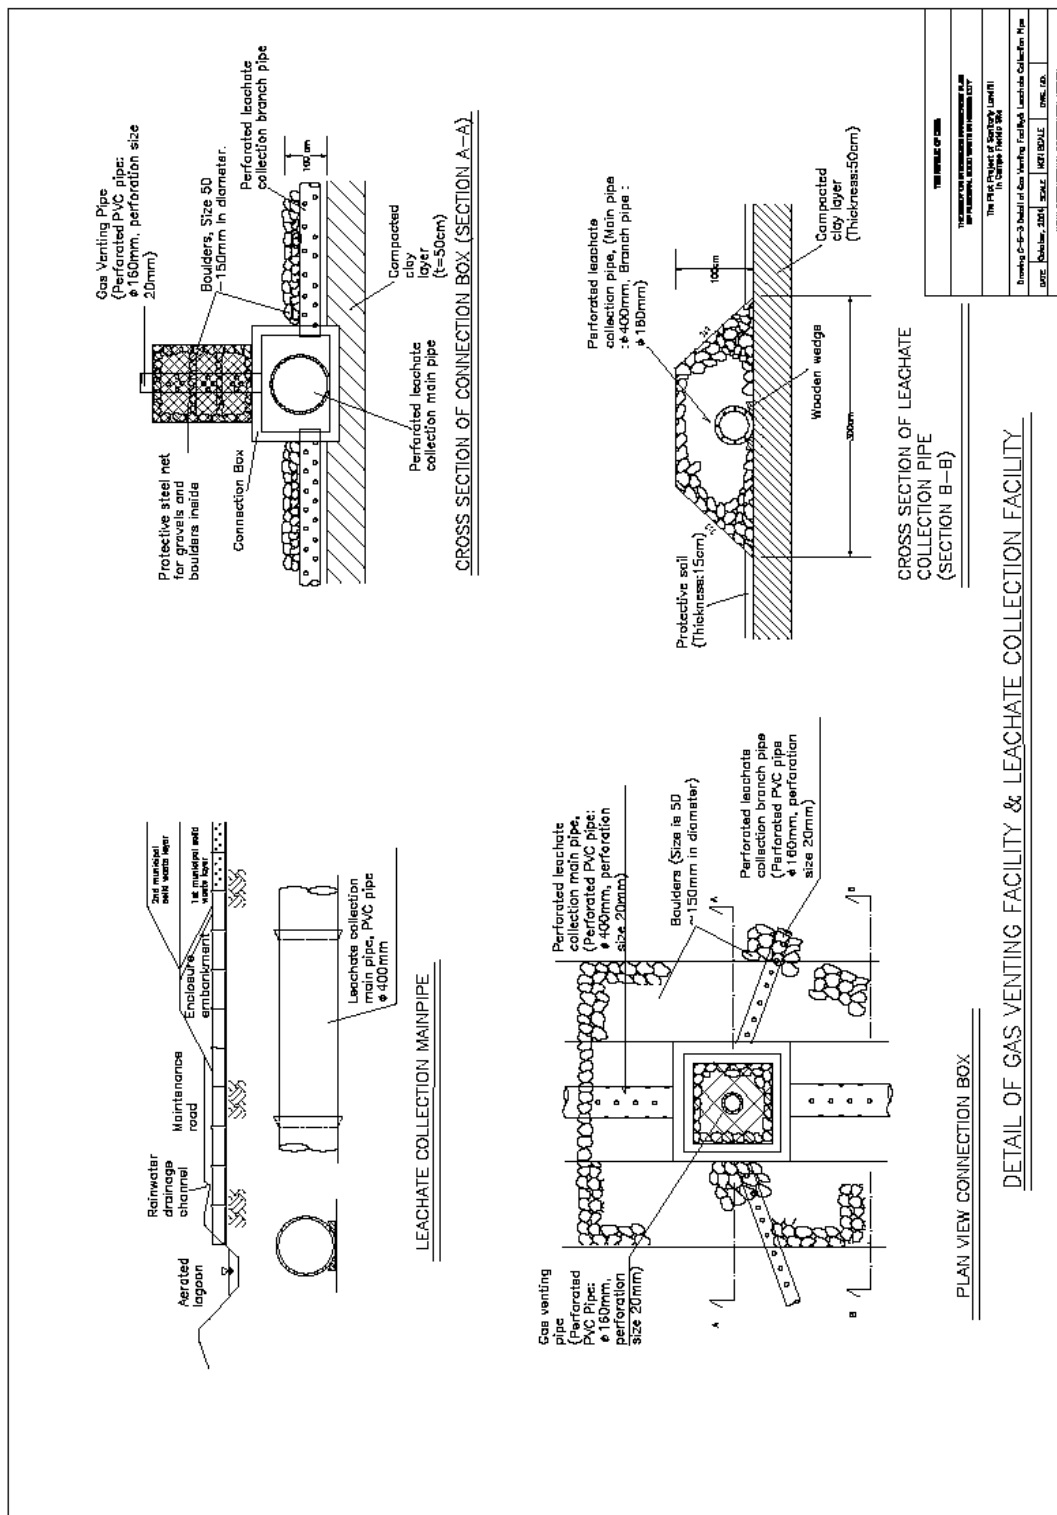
Details of Leachate Collection System in Campo Florida Landfill Site
